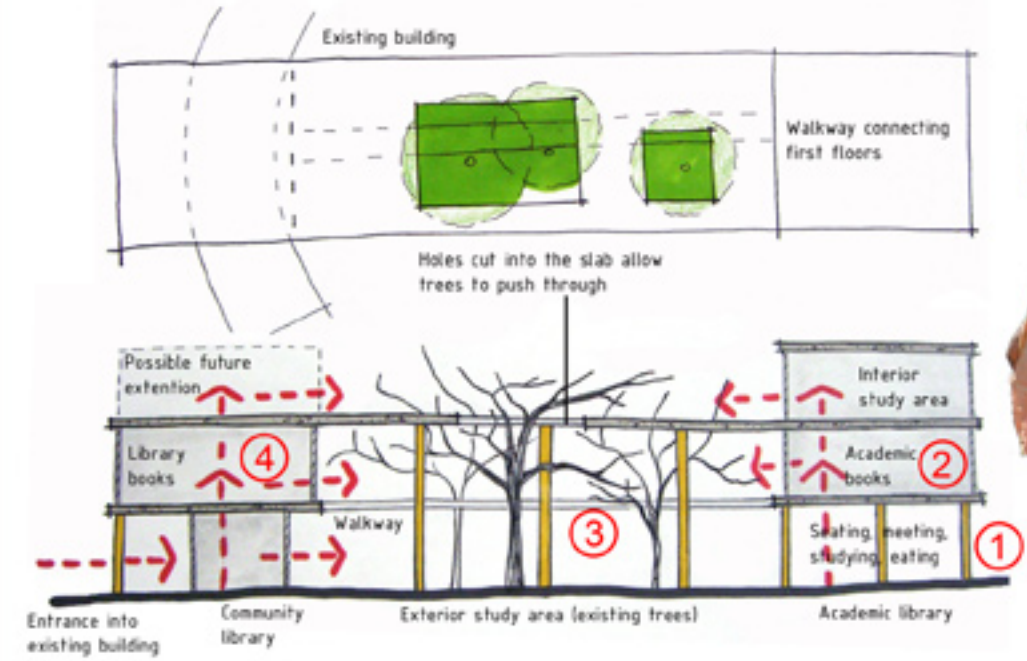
Diagrammatic plan and section of proposed library building (Author, 2008)
